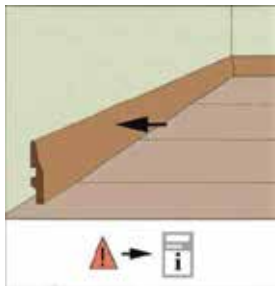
Skirting, scotia or quad can be installed around walls. This must not be fixed with nails or screws to the boards and only to the wall. Carefully install skirting, scotia or quad so that it is not pushing down on the boards. This will affect the floors ability to expand and contract and may lead to product failure.
